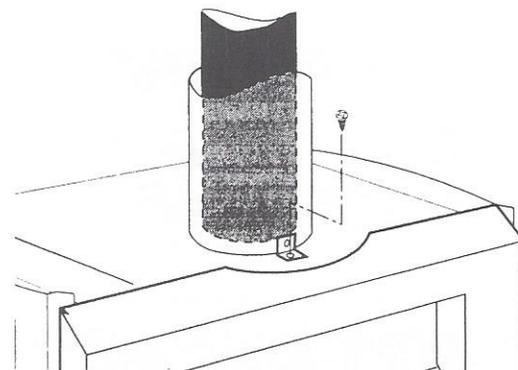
Install mounting bracket and decorative pipe over the B-vent pipe.
